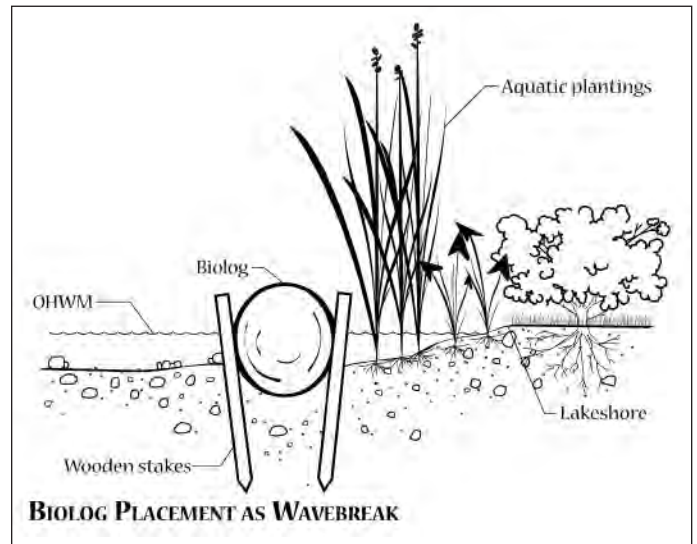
Biodegradable linear shoreline protection placed lakeward as a wave break to protect aquatic plants. (Source: MSU Extension.)
